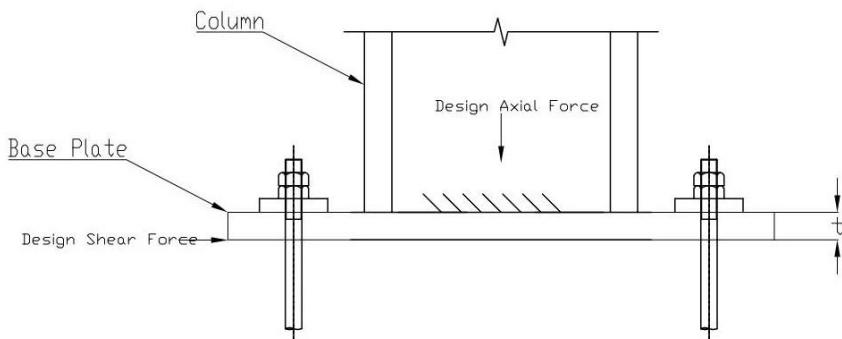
Figure showing the elevation of the column base joints considered in this project.
